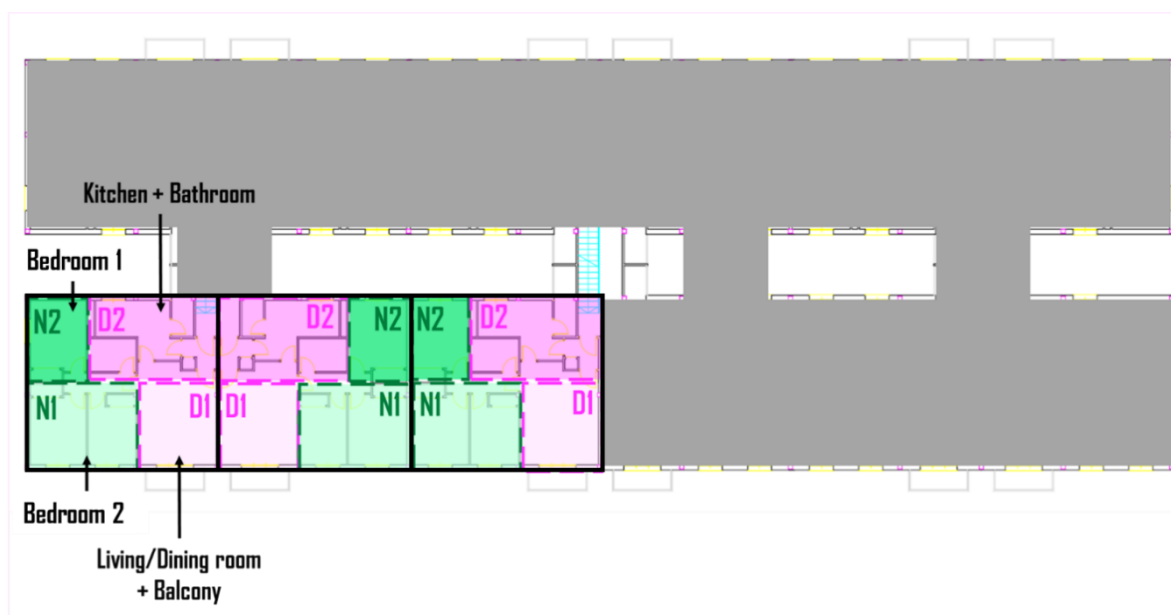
The internal distribution of the floor with thermal zones proposal (Archetype 1).
